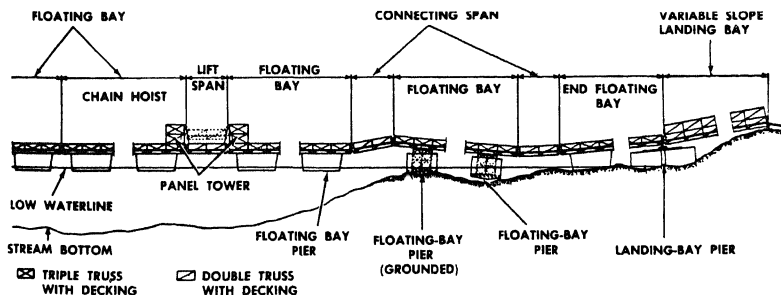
Nomenclature of panel bridge on barges. Gradual sloping bank (with grounded piers).
